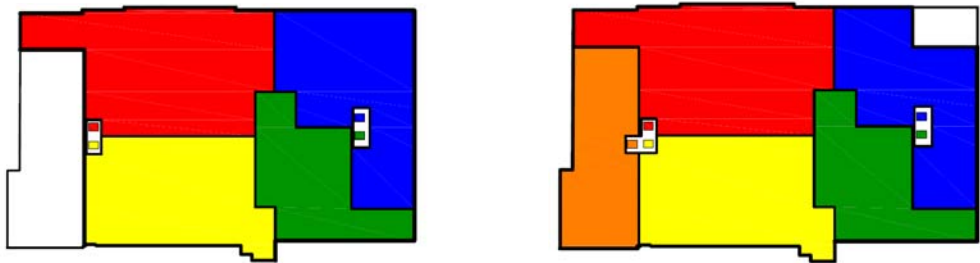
B Floor 2 and Floor 3 Existing AHU Layout.
